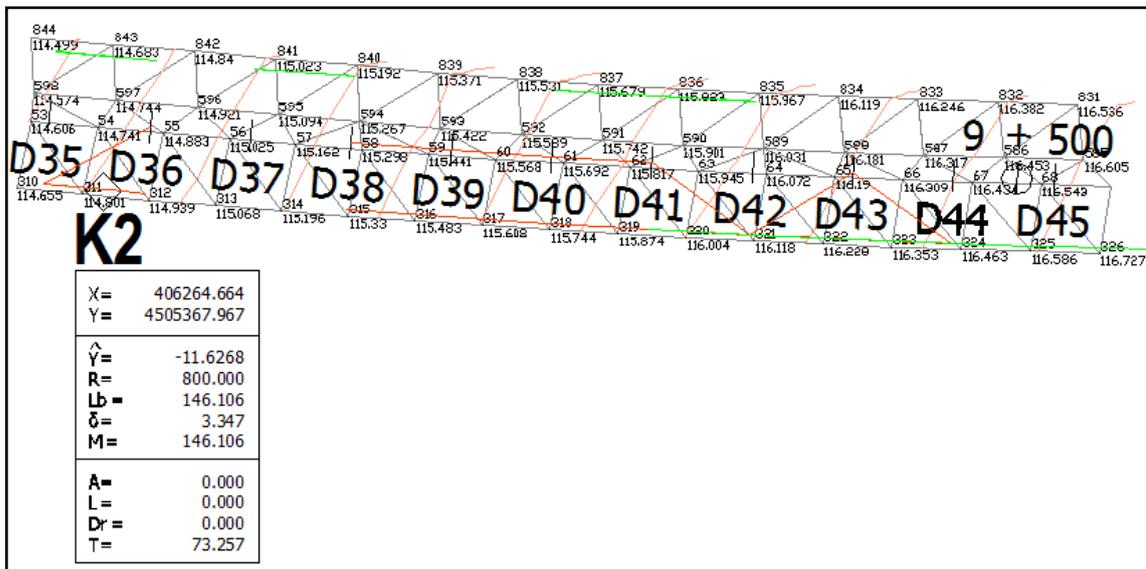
Detail of the reconstructed road horizontal plan, DPSM by velocity 20-25 km/h, passing B
